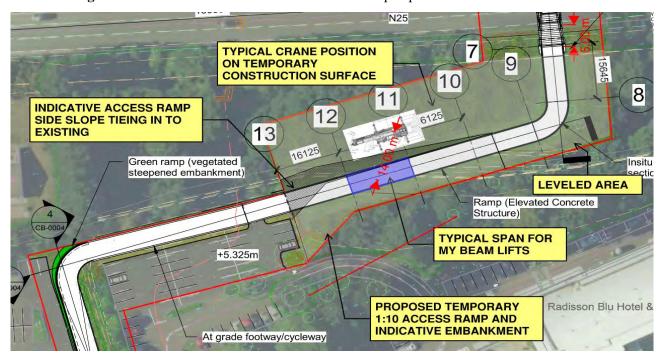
Proposed methodology for erection of southern elevated ramp precast concrete bridge beams
